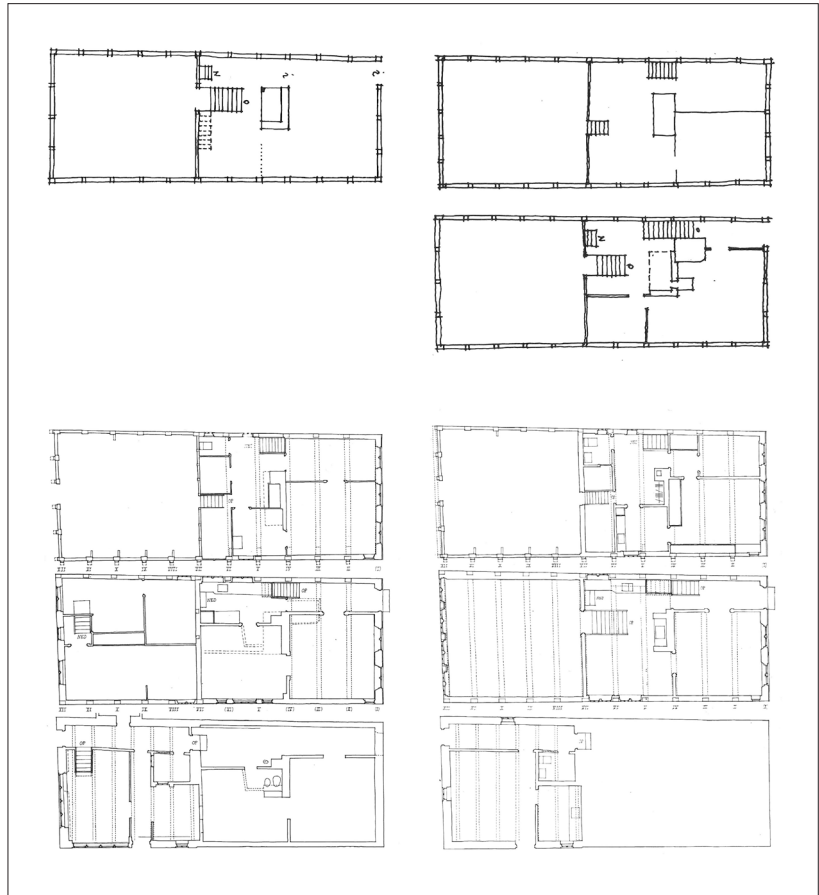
Layouts of Grønnegade 12, scale circa 1:250. Top left: Reconstructed layout of the original building, comprising a parlour and frengulv (the first room in the dwelling, usually connected to the kitchen). Top right: Reconstructed layouts of the eighteenth-century rebuilding. The upper layout comprises storage and chambers, whereas the ground floor towards Grønnegade has been divided into more rooms such as kitchen and living room. Bottom left: Before the conservation of 1976–83. The building has been divided into more tenancies. Dotted lines indicate traces of former layouts. Bottom right: Conservation project. The layout takes its point of departure in the layout of the eighteenth-century building. Drawings by Steffen M. Søndergaard.
